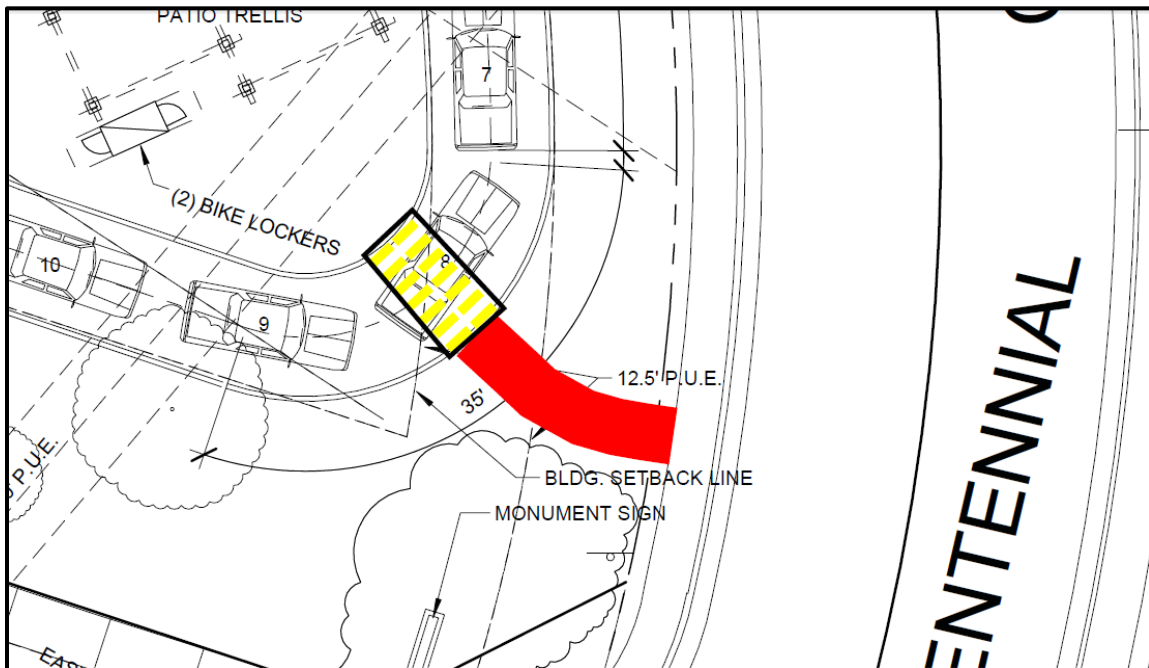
Sidewalk (red) and raised crosswalk (yellow) near southeast corner of building plaza
